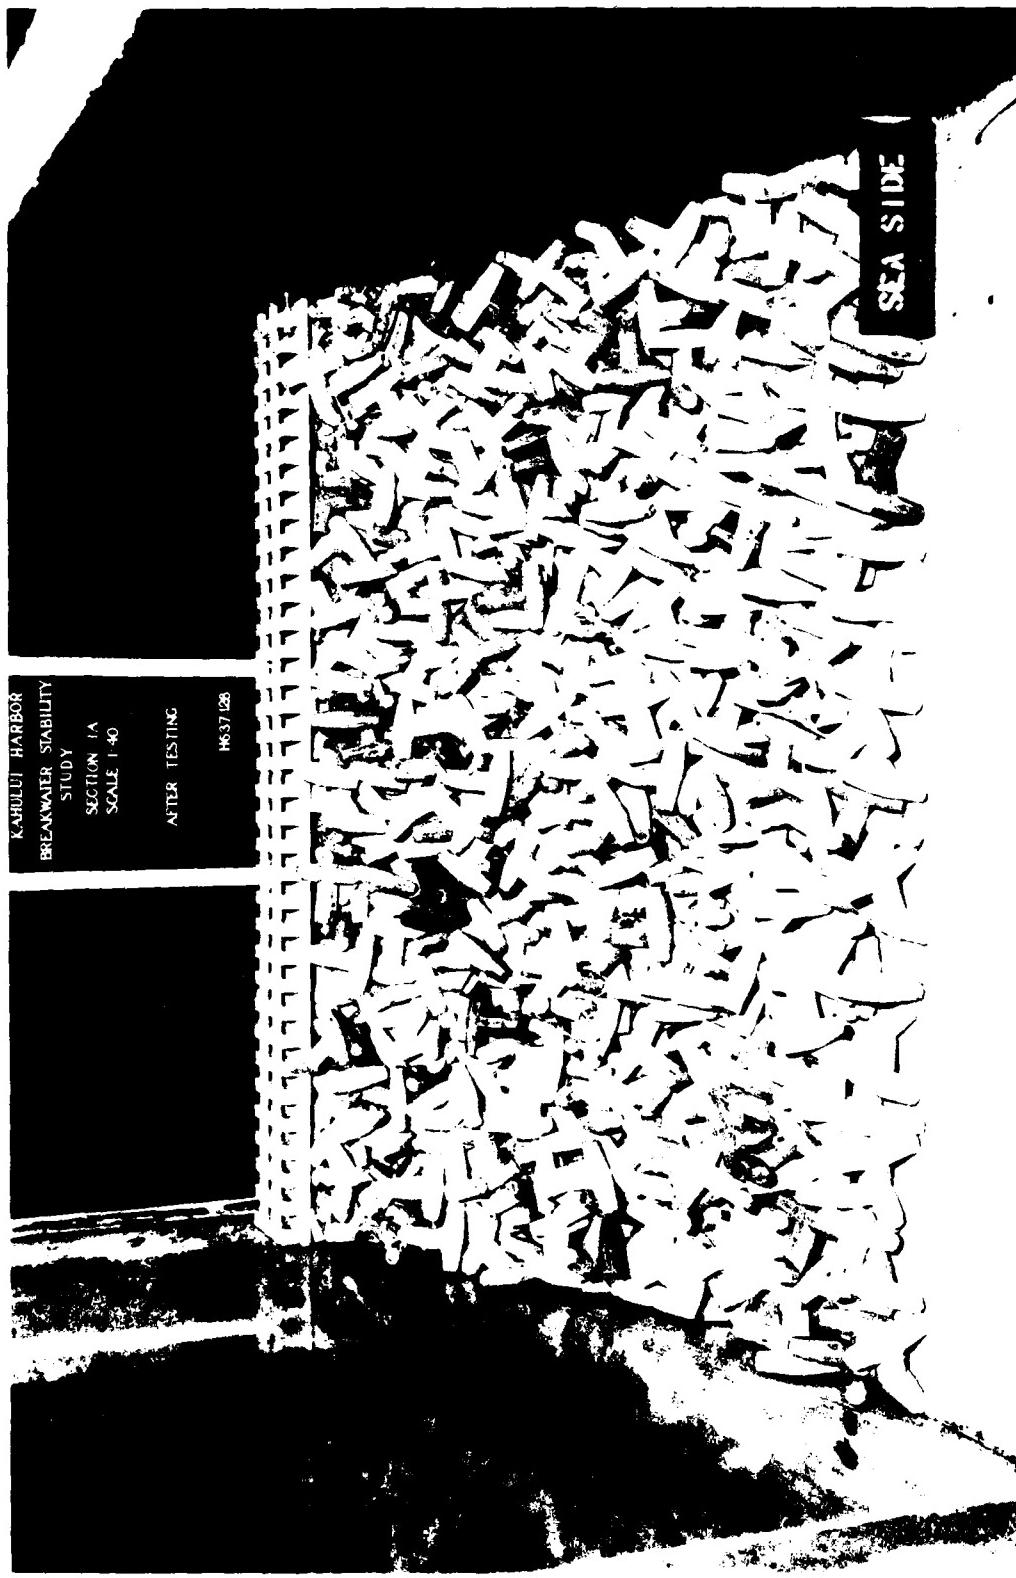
Sea-side view of Plan 4A after testing, 2nd test
